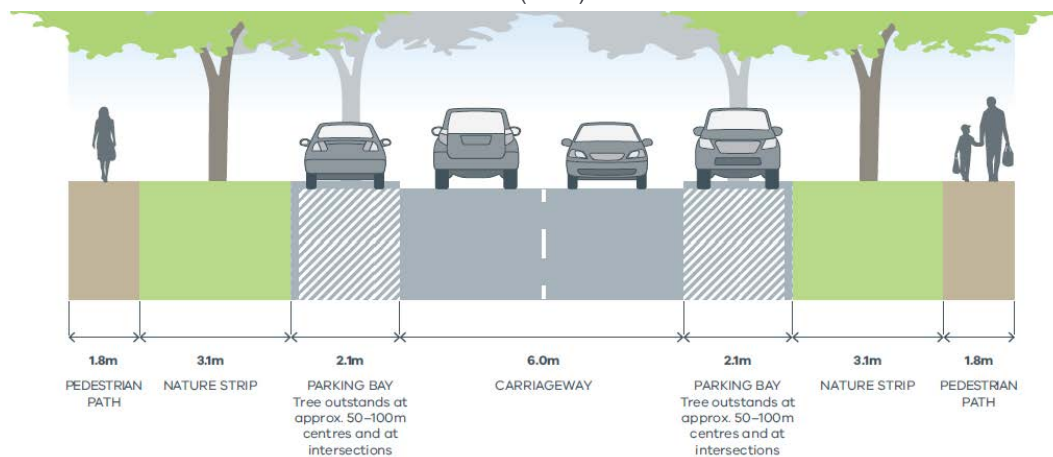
Local Access Street Level 1 – 16m Reserve (Draft)
